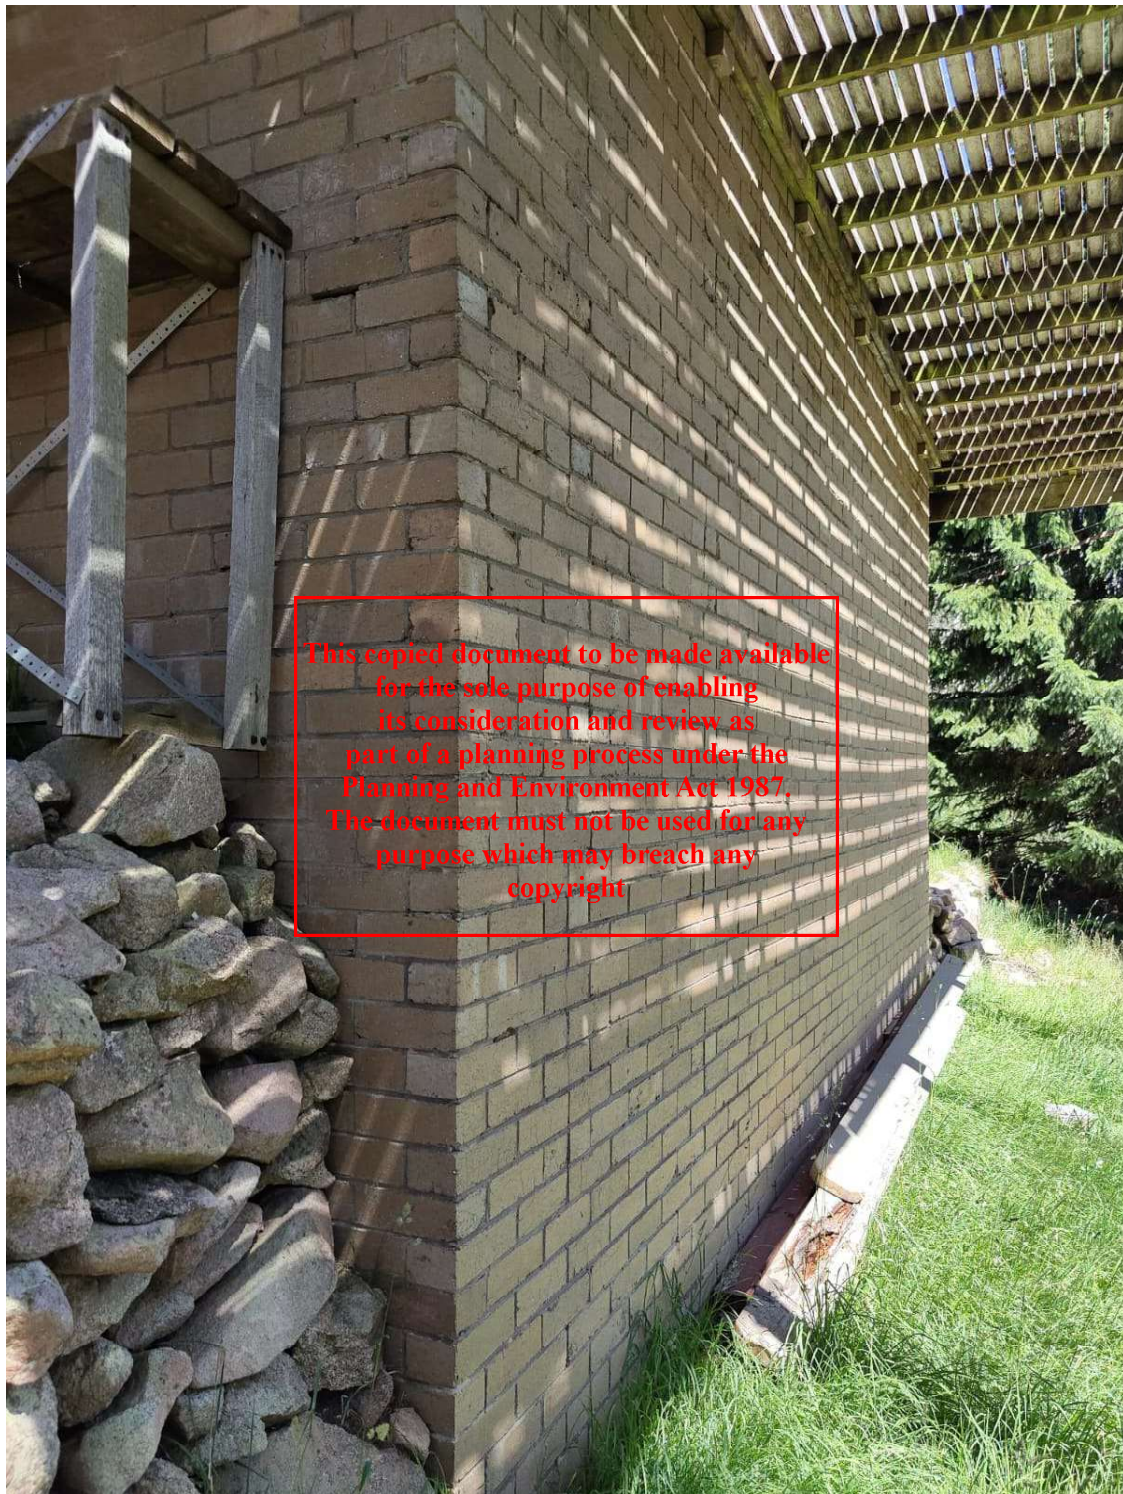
Northern side of property central area, looking southeast. Brick facing showing no signs of distress.
